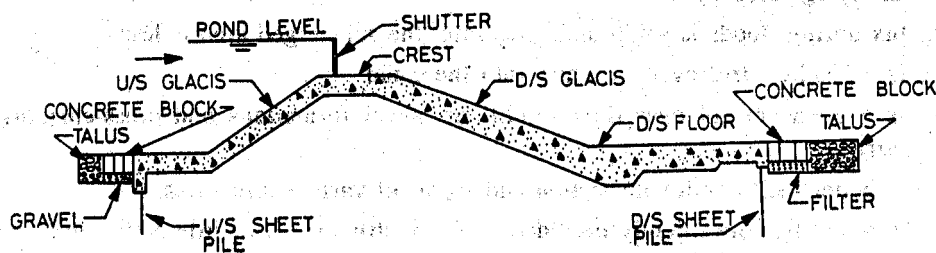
Typical cross section of concrete weir with downstream glacis on permeable foundation
